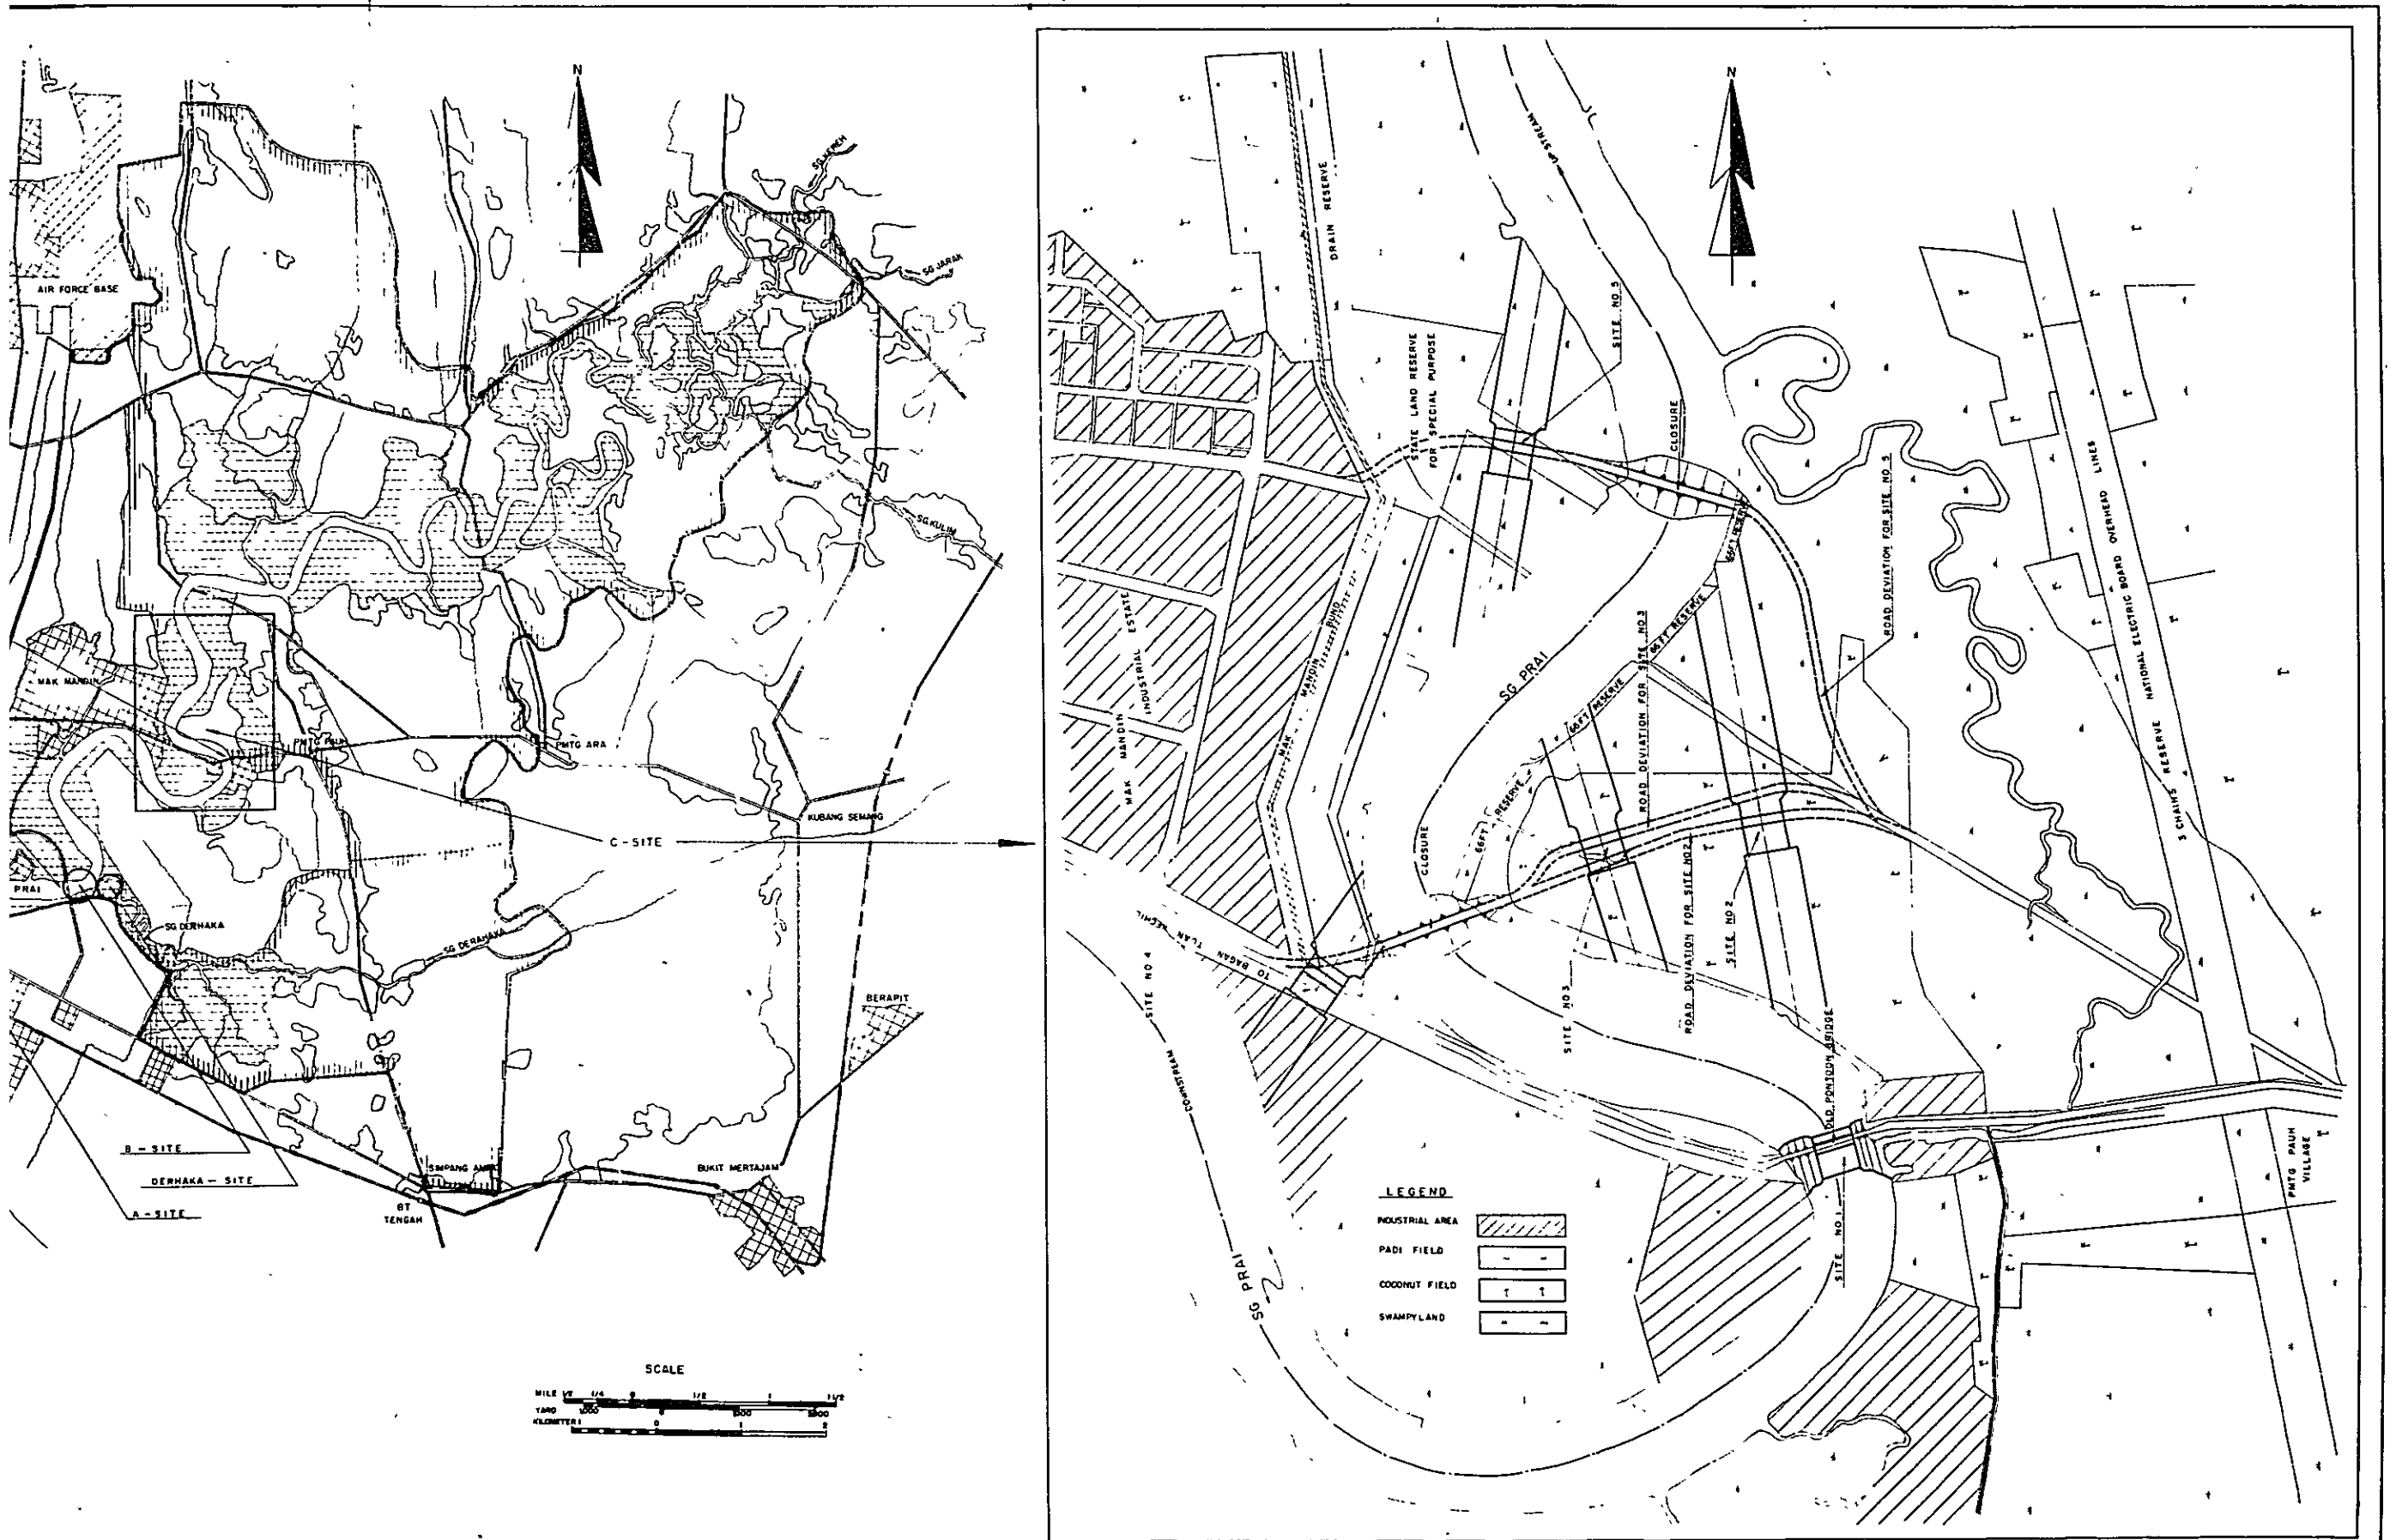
PROPOSED SITES OF BARRAGE AND BOUNDARIES OF BENEFICIAL AREA ON DRAINAGE CORRESPONDING TO BARRAGE SITES
